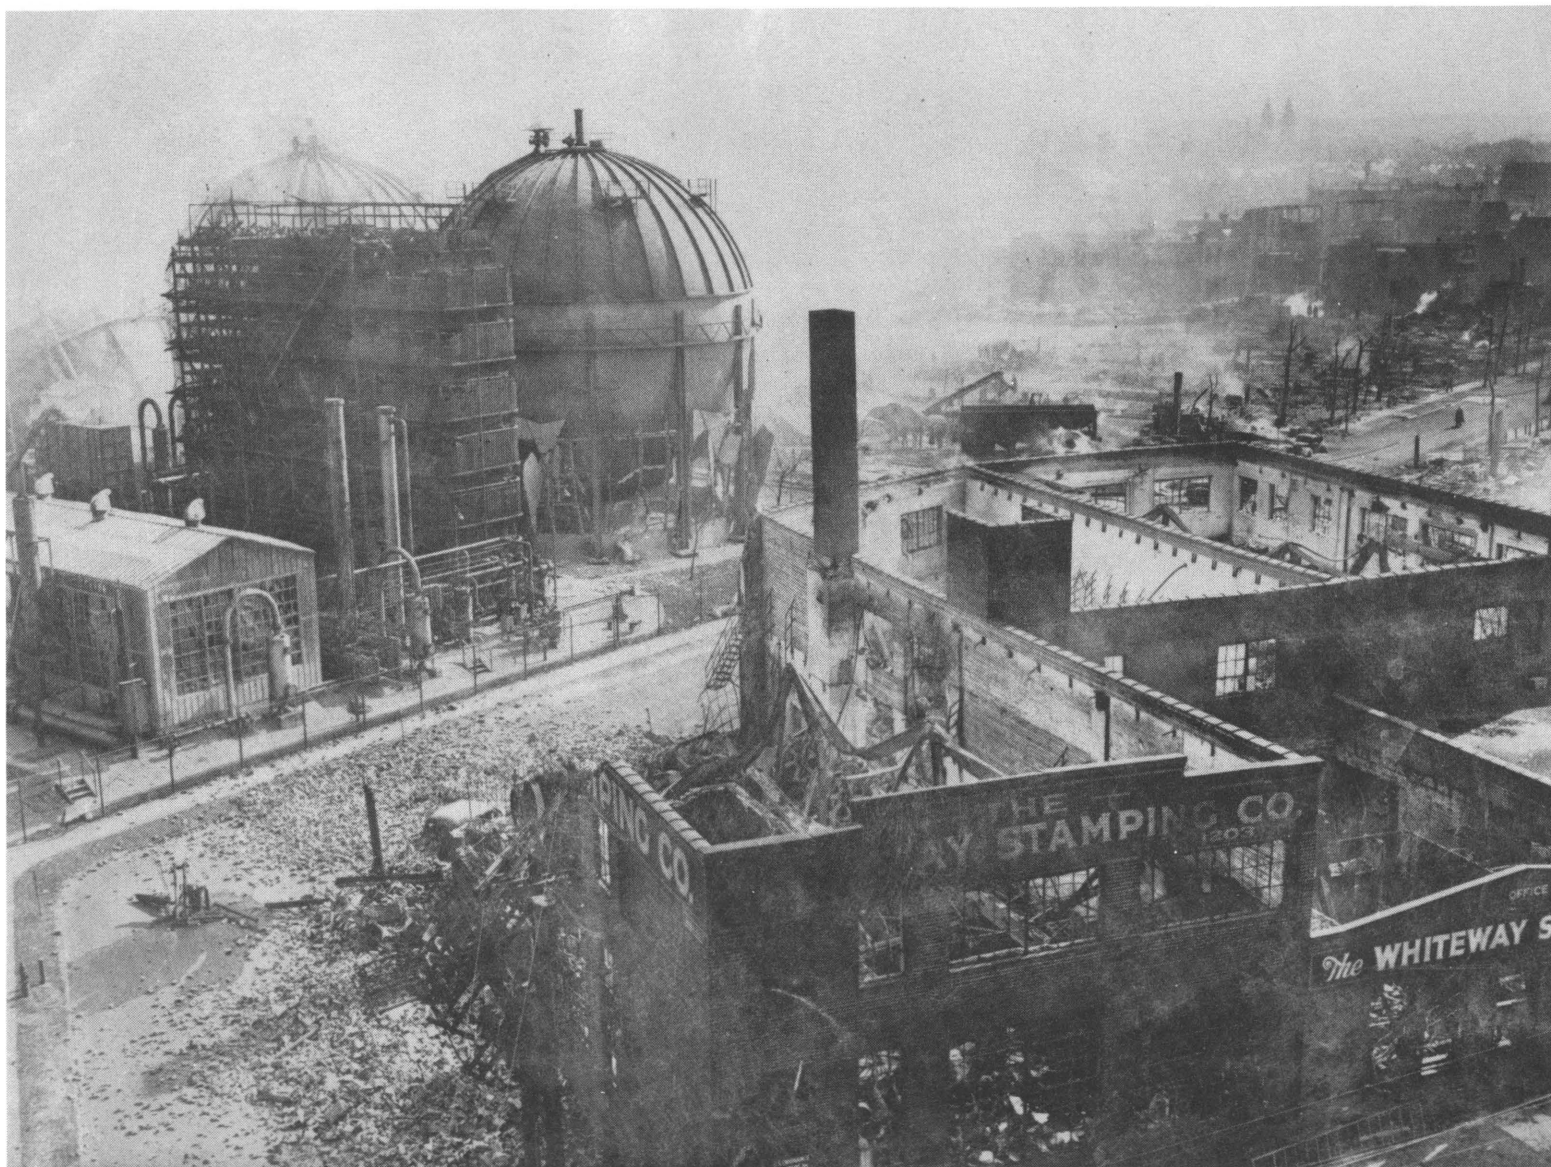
View of damage in the vicinity of the LS & R plant, East Ohio Gas Co., looking east, and showing damage to the Whiteway Stamping Co. in the foreground, remains of dwellings on the east side of East 61st Street (right background), and spherical tanks 1 and 2, cooling tower, and compressor building of the LS & R plant (left background).
